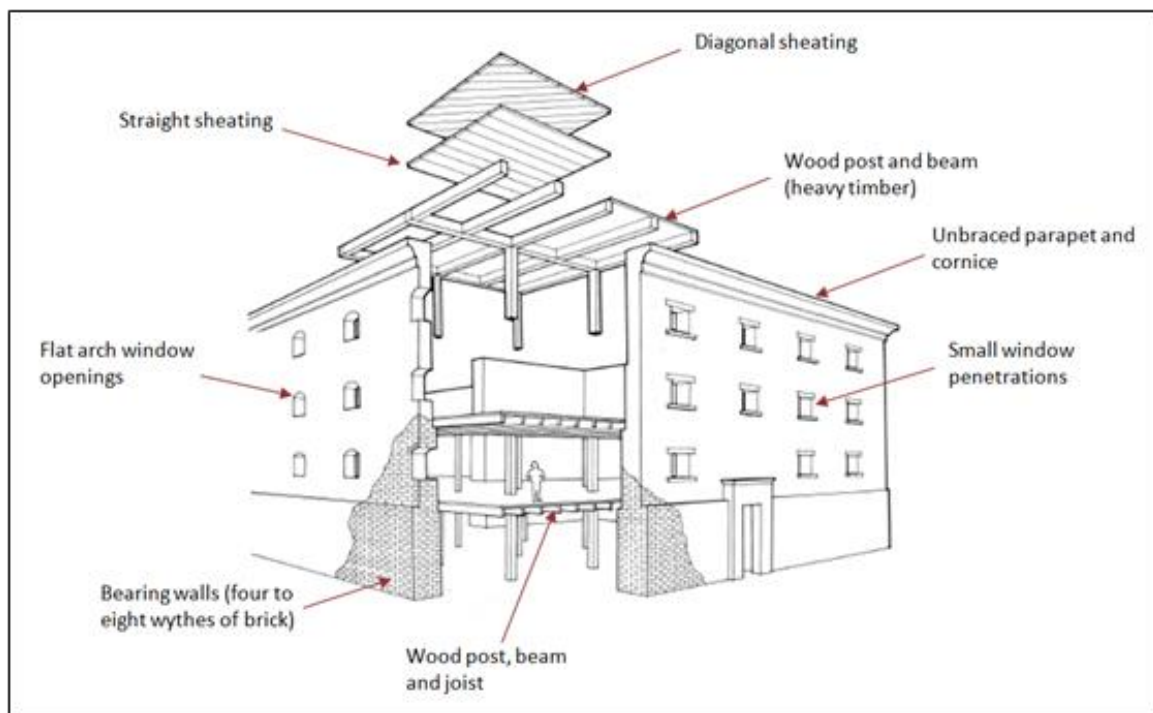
Unreinforced Masonry Buildings (FEMA, 2015)
